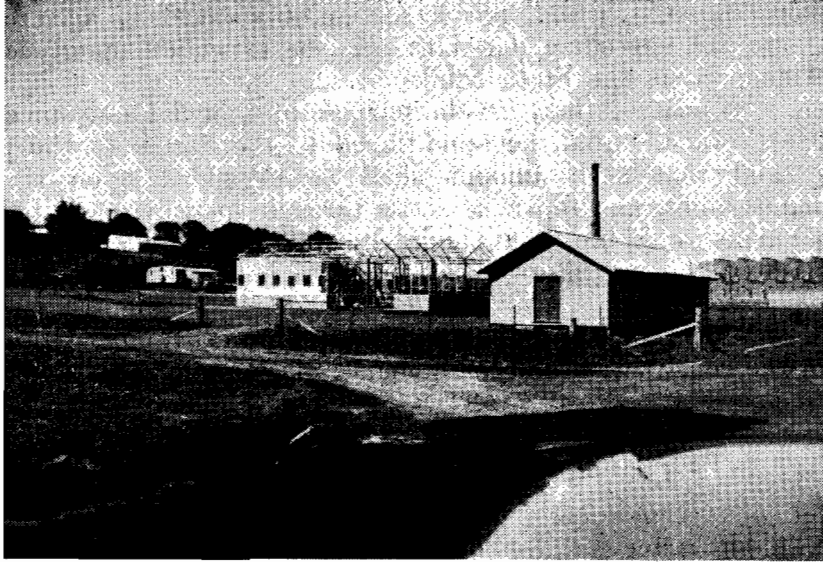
Geelong Depot—Workshop and Store building in course of erection.
